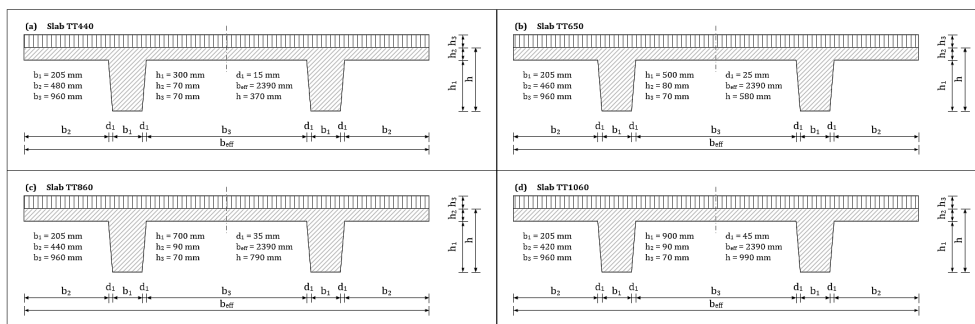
Variants of cross sections of the TT floor slab: a) W-01 variant of the TT440 slab; b) W-02 variant of the TT650 slab; c) W-03 variant of the TT860 slab; d) W-04 variant of the TT1060 slab
